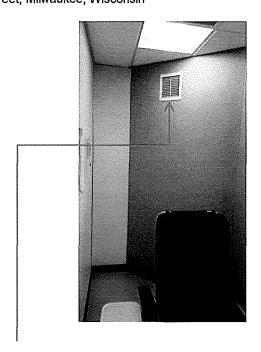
1301 Canal; typical office area supply air duct, mezzanine level, column L2.5.
